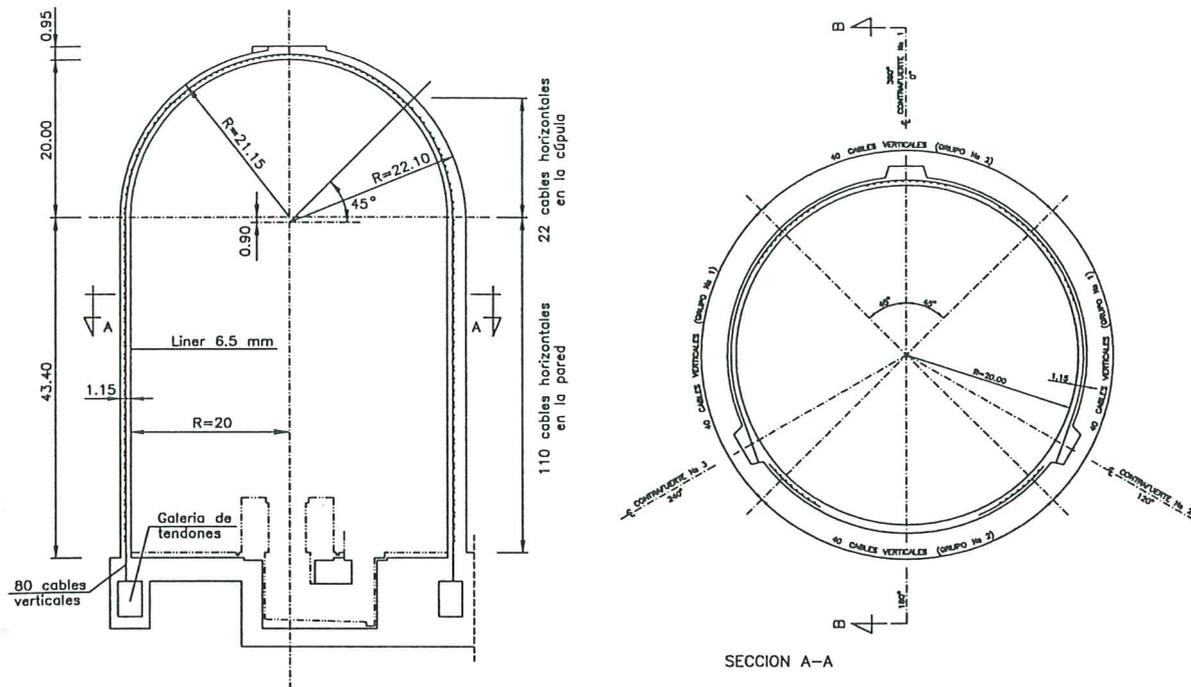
Containment shell. (a) vertical section; (b) horizontal section.
